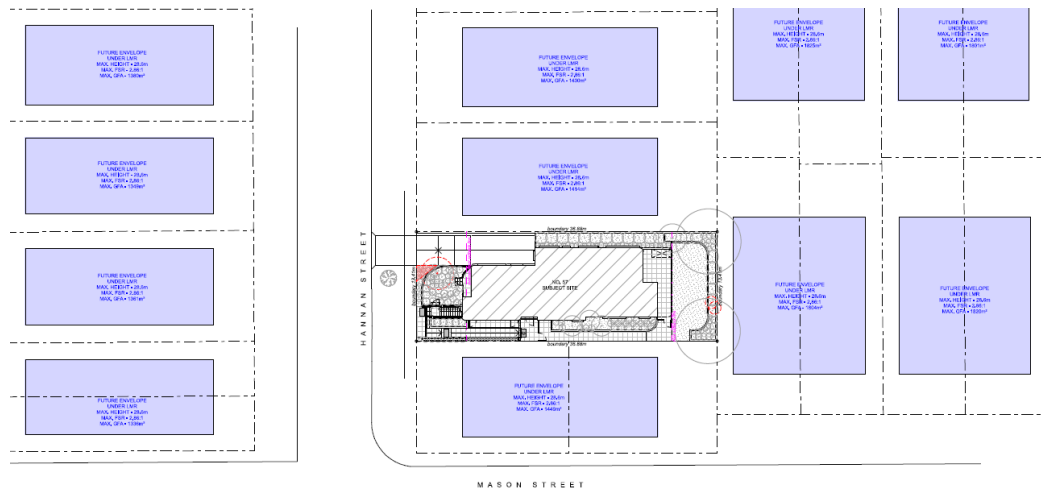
Plan showing indicative building envelope and massing analysis (Source: Archispectrum)
